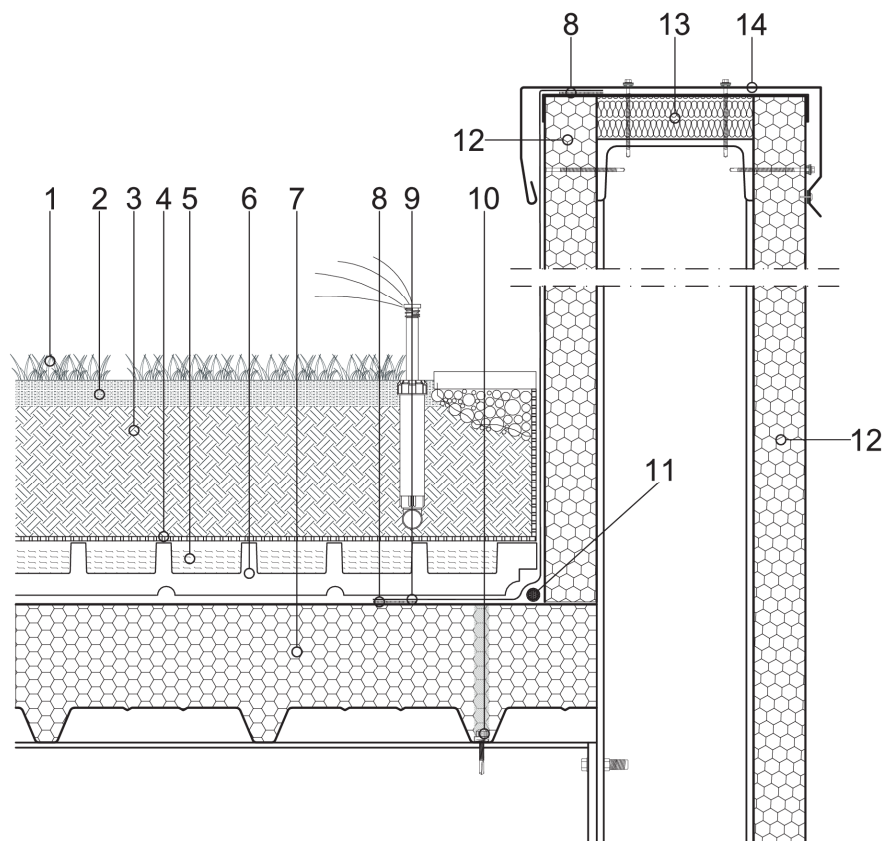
DETAIL OF SIDE CONNECTION FOR NATURAL GREEN ROOF
